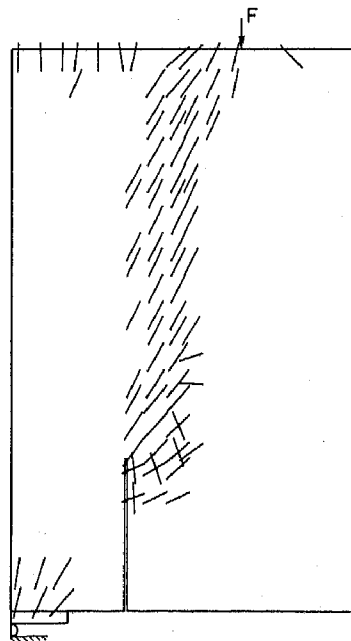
(a). Crack pattern at ultimate load. All cracks.
